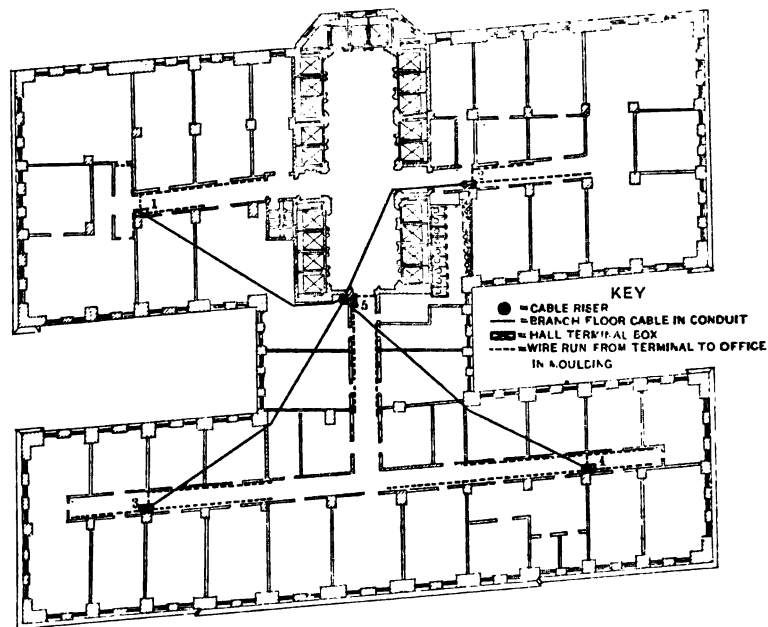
TERMINAL BUILDINGS—TYPICAL FLOOR PLAN IN CORTLANDT BUILDING.
